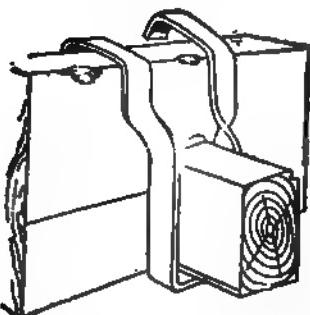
Double Stirrup-Hanger, Showing Failure.
